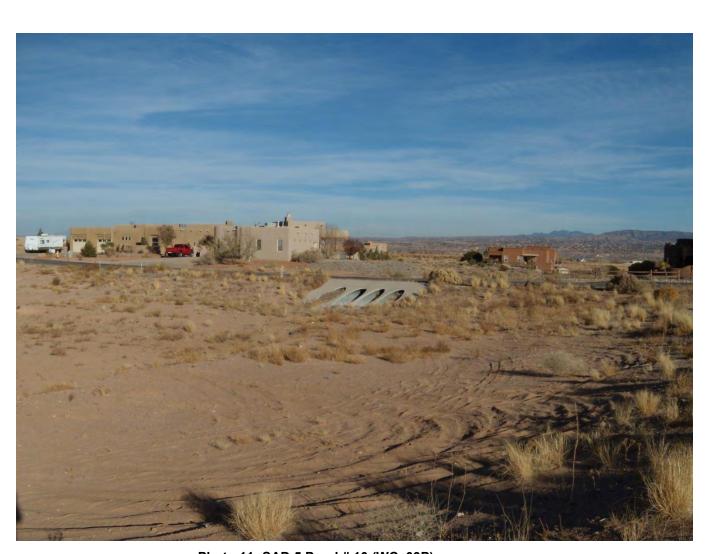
SAD 5 Pond # 10 (WC\_03P)
